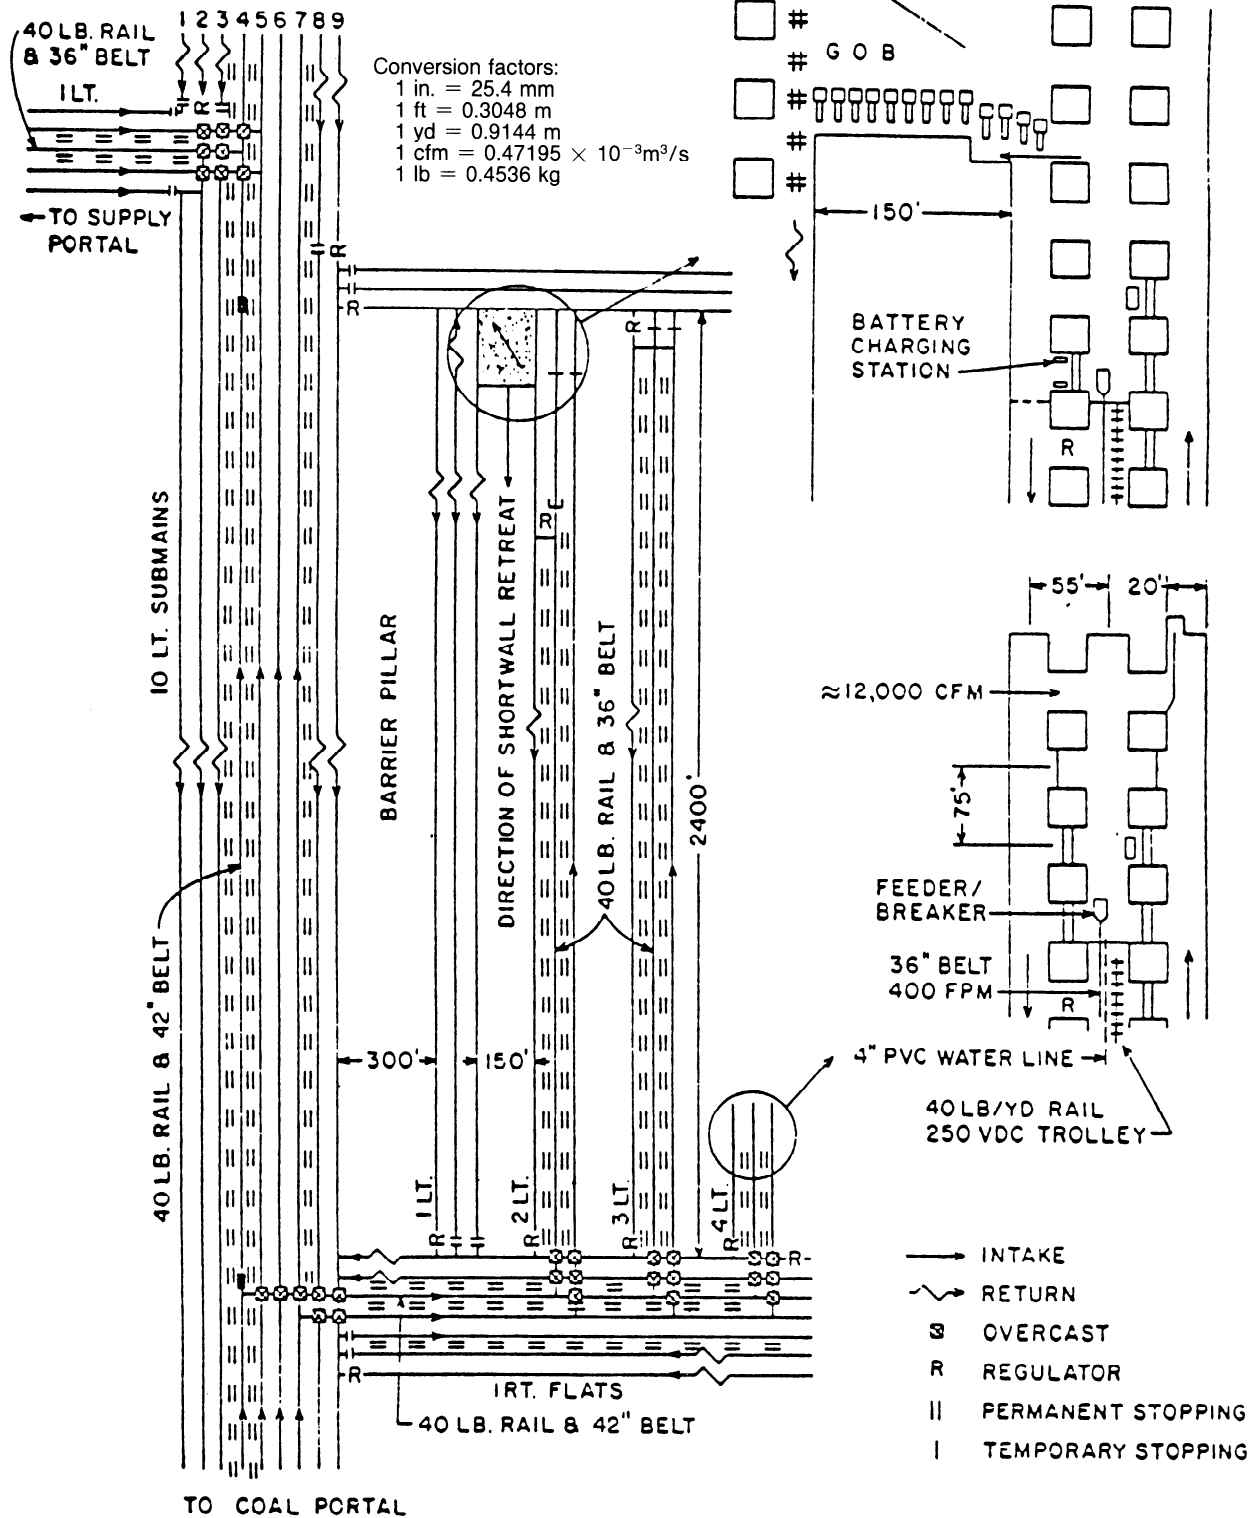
Shortwall ventilation scheme (Stefanko, 1983).
